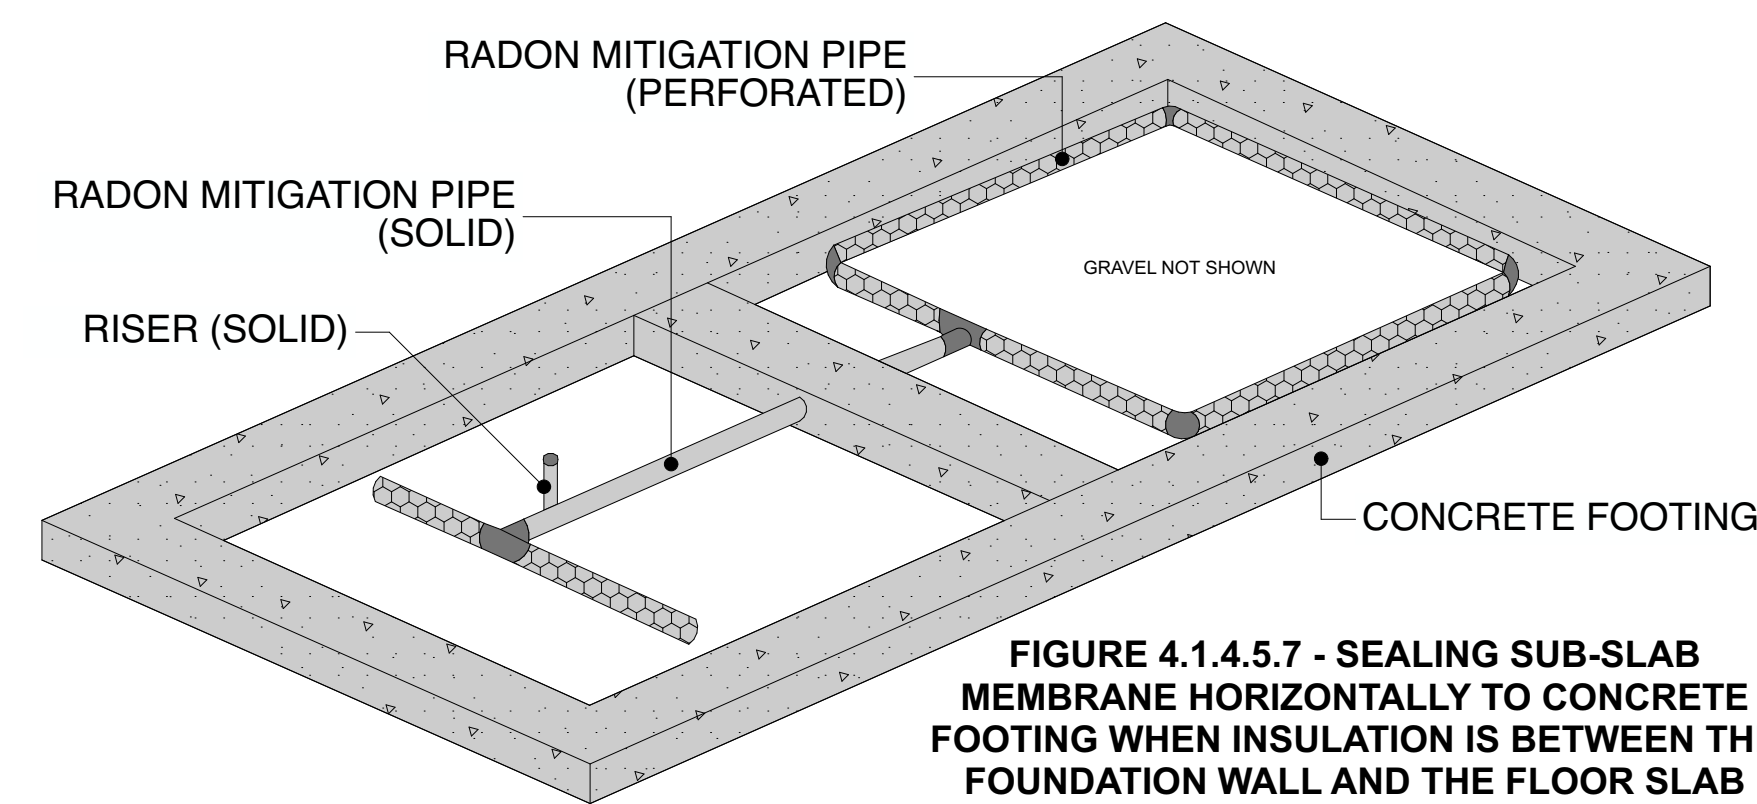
SEALING SUB-SLAB MEMBRANE HORIZONTALLY TO CONCRETE FOOTING WHEN INSULATION IS BETWEEN THE FOUNDATION WALL AND THE FLOOR SLAB
